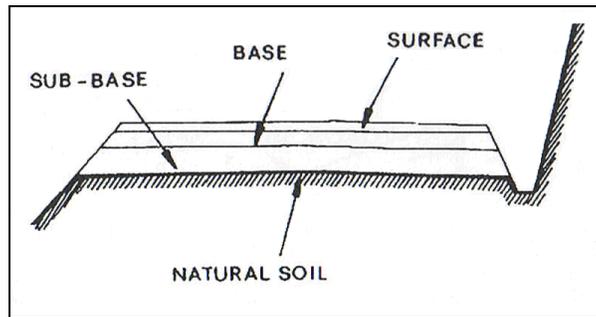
Typical design of a public low-volume road (Sessions, 2007)
